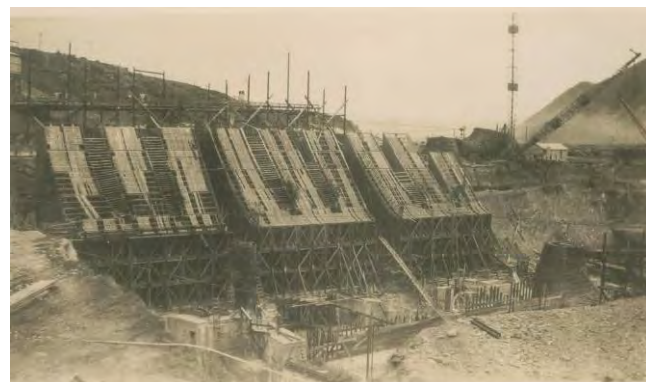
Power House Foundation Construction and Concrete Intakes and Penstocks c1930-31
